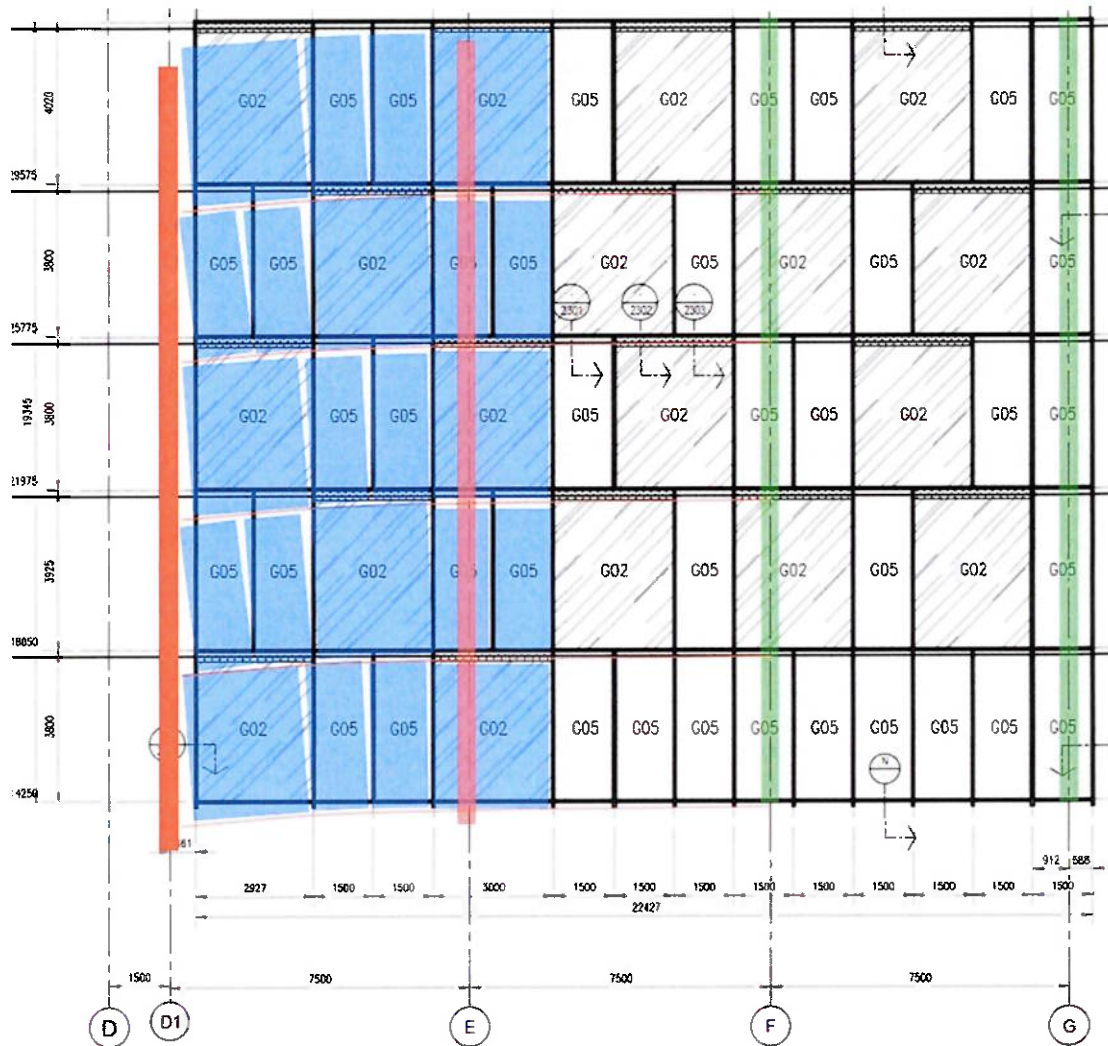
EWS-003 South elevation, Deformation due to ground settlement
